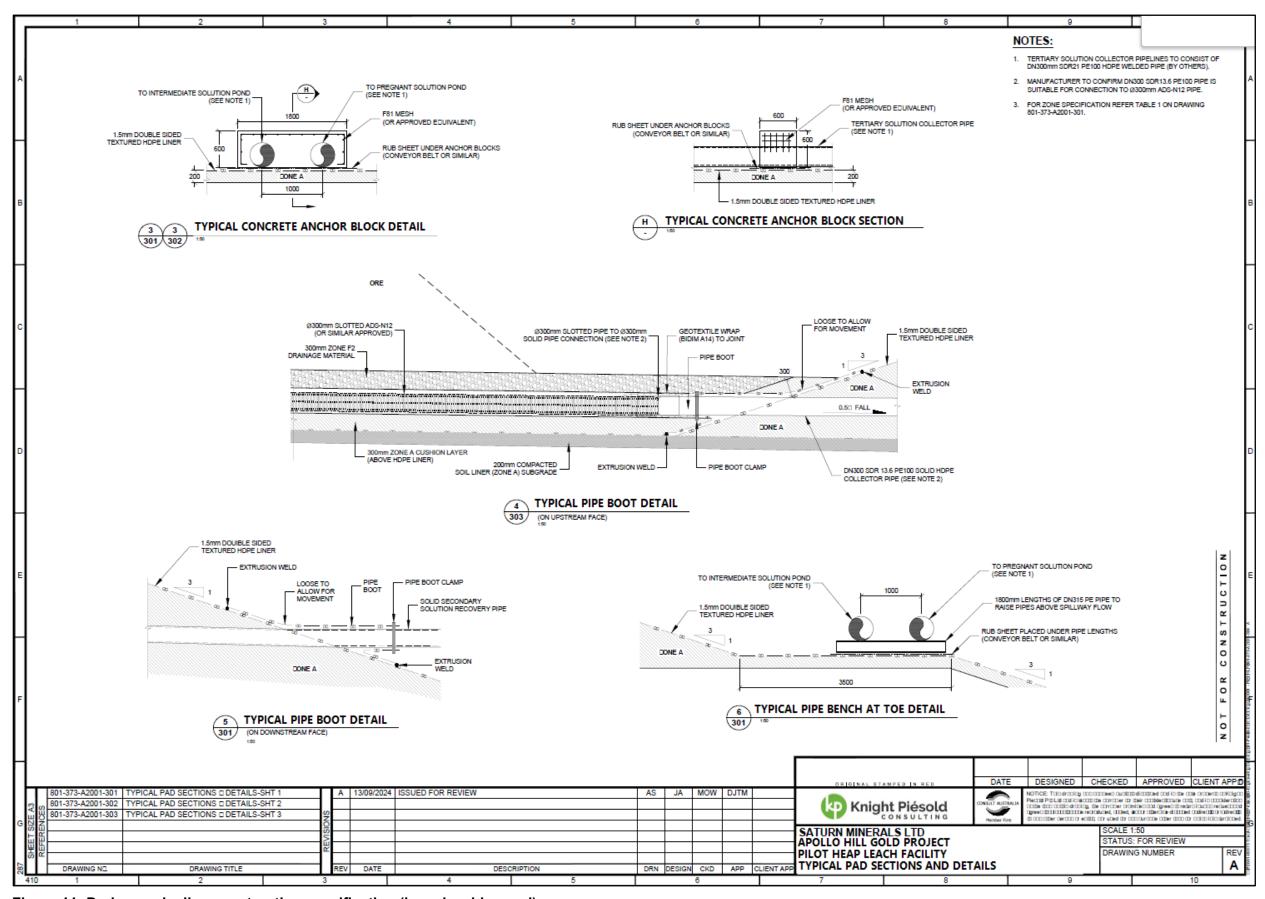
Drainage pipeline construction specification (heap leaching pad)
